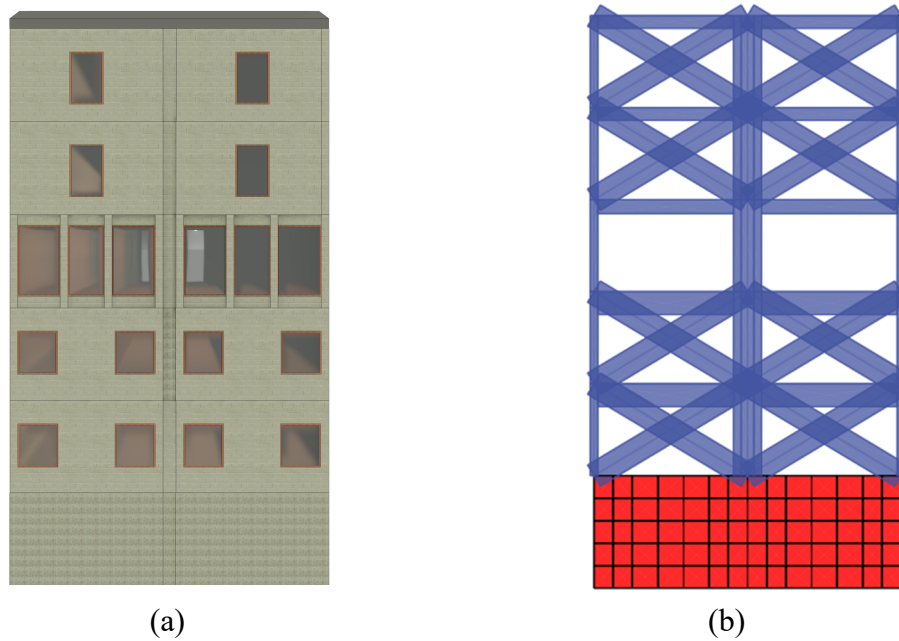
(a) Architectural and (b) finite element models of the south elevation of the building.
